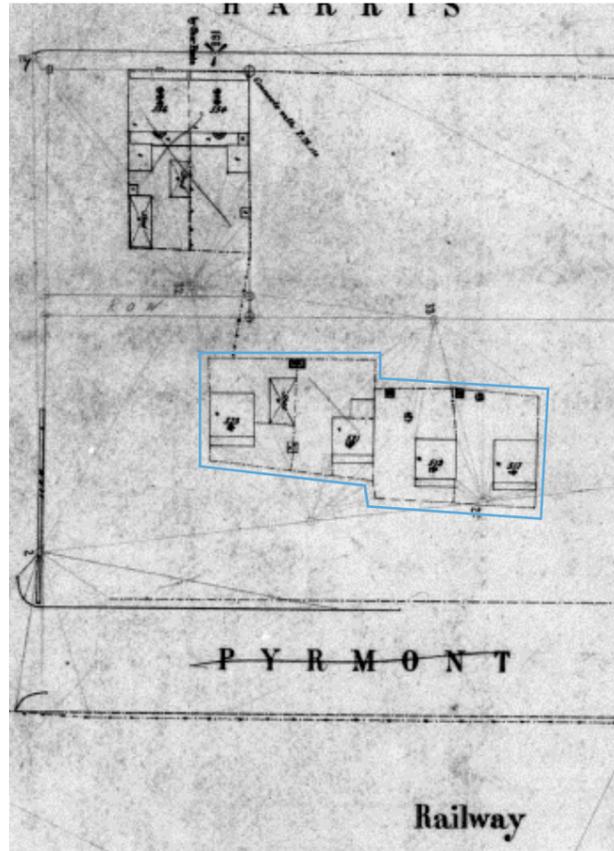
Detail from 1886 plan showing houses at 517–523 Pyrmont Street (Source: Sydney Water PWDS 1544-S206)
